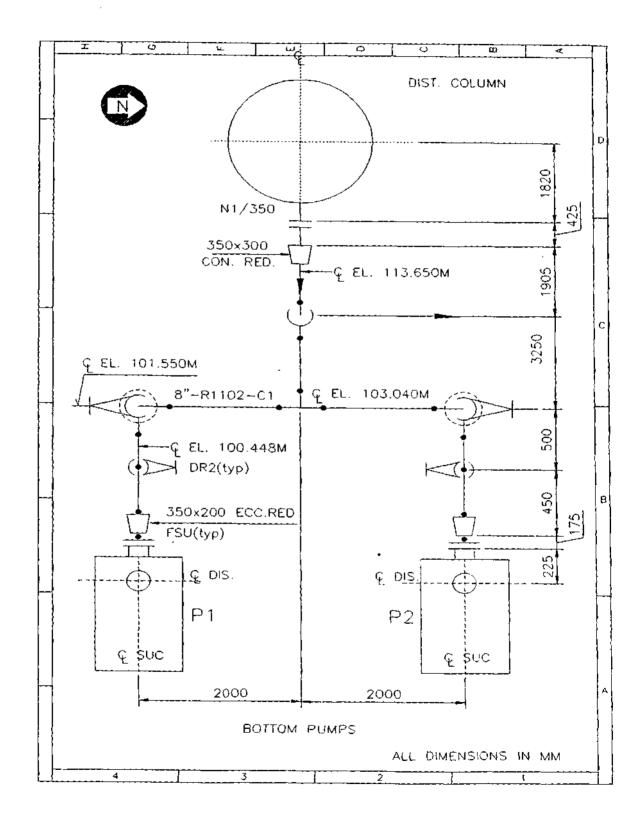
TYPICAL GENERAL ARRANGEMENT OF PIPING
